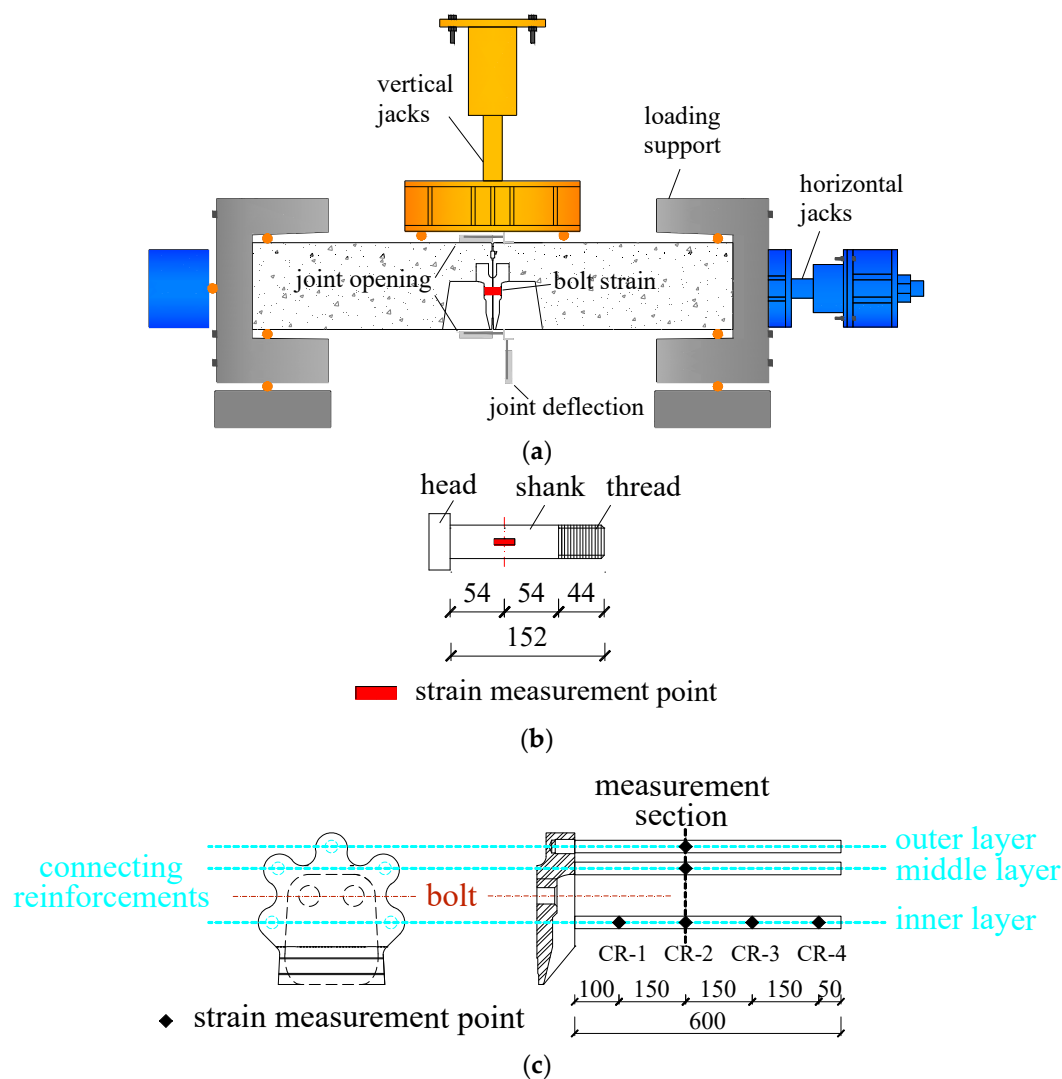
Measurement points: (a) joint opening, joint deflection, and bolt strains; (b) details of a bolt strain measurement point (unit: mm); (c) strain measurement points on the connecting reinforcements (unit: mm).
